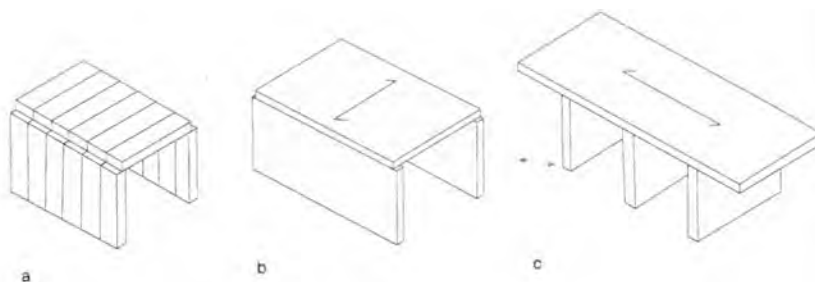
Construction principles of panel systems: Small-panel (a), Large panel (b) and Cross wall construction (c).⁹³
